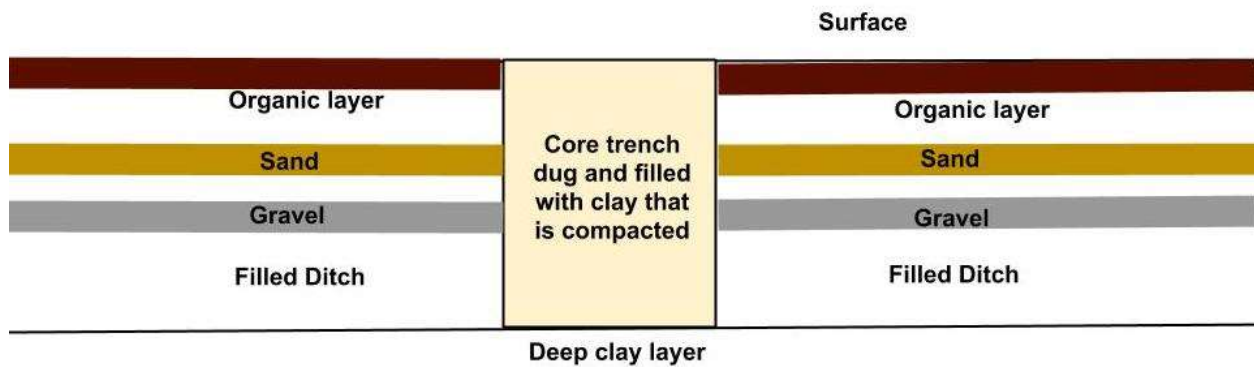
Core trench filled with clay that is compacted to block subsurface water flow in borrow pit ditch or drainage ditch (typical profile view).
